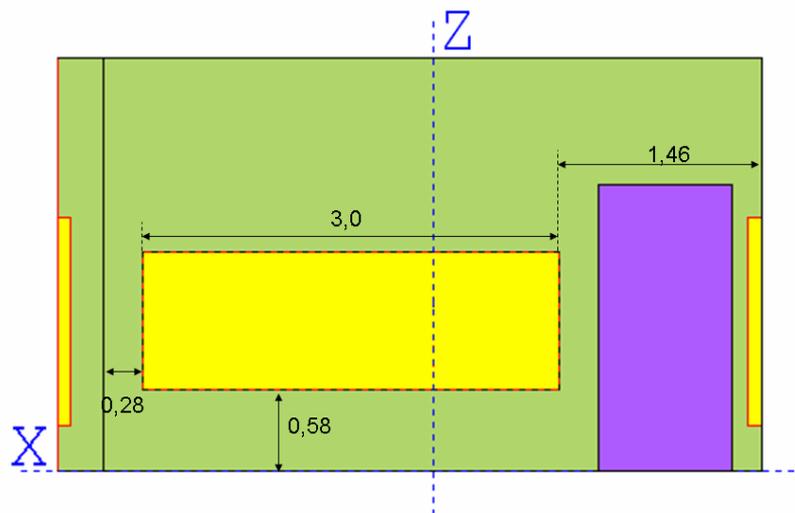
Door perspective of the listening room without the step ceiling with all absorbers visible from this view
